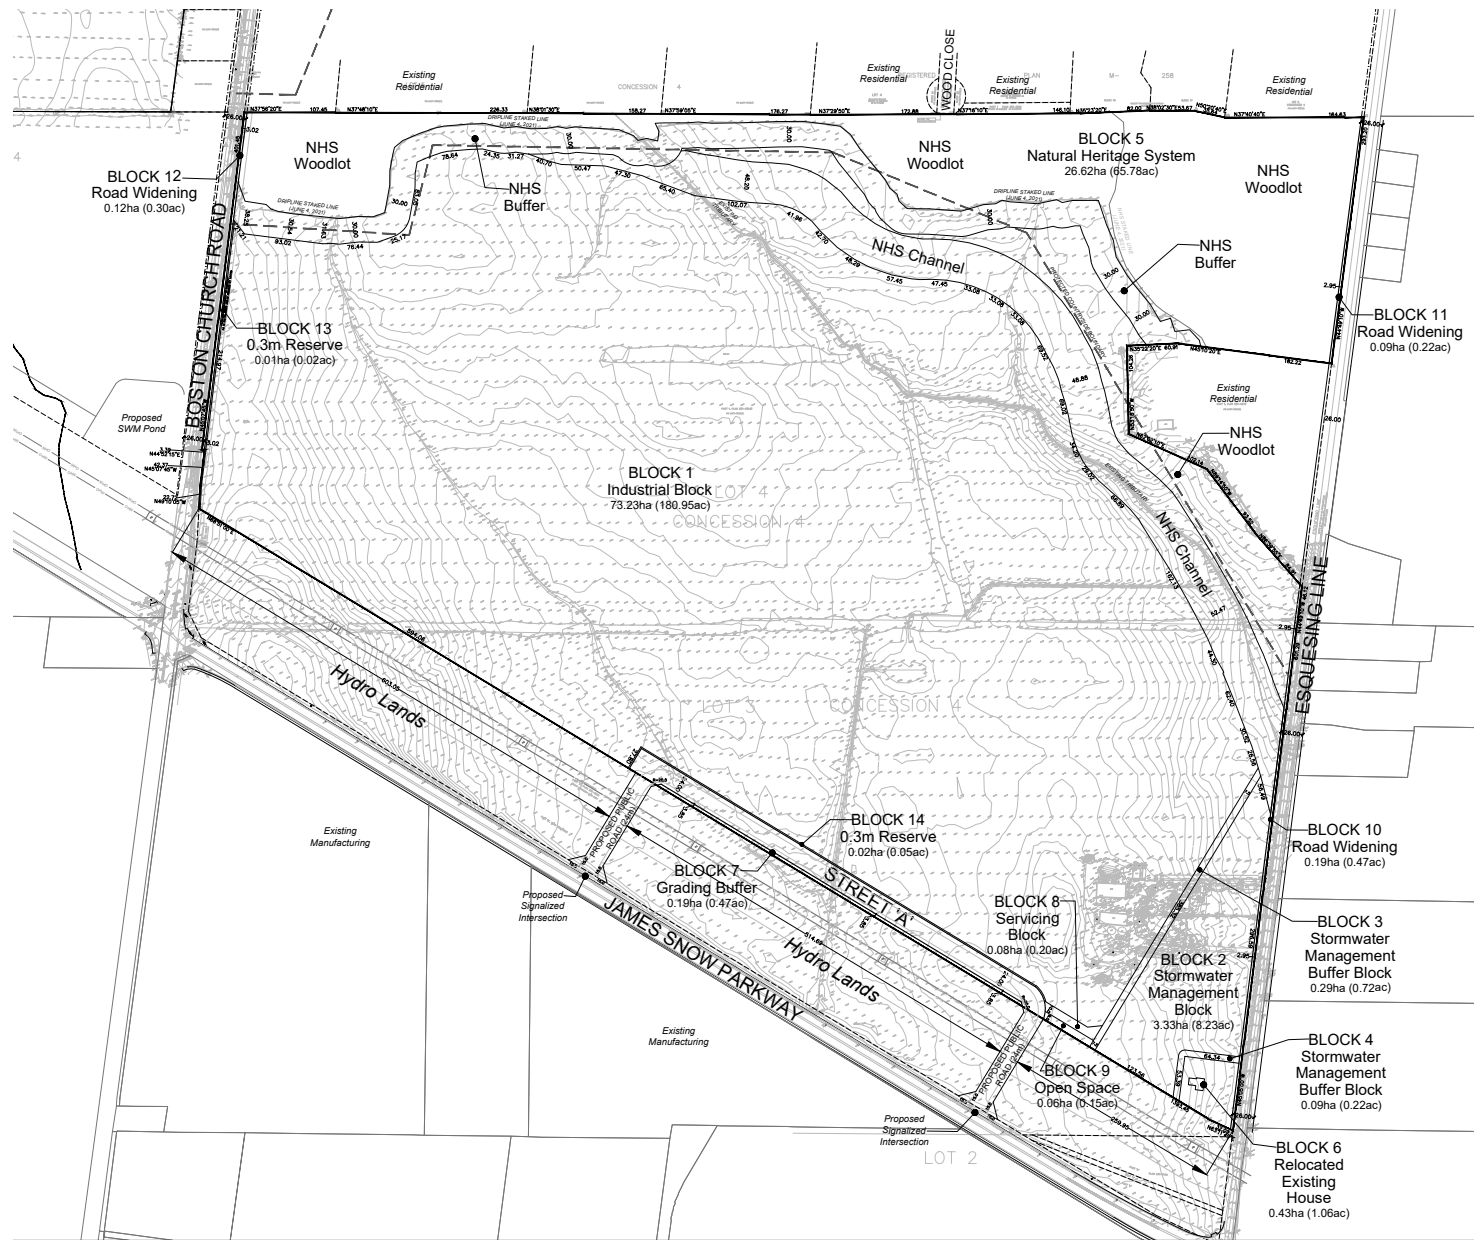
East Draft Plan of Subdivision (East Block - October, 2023)
